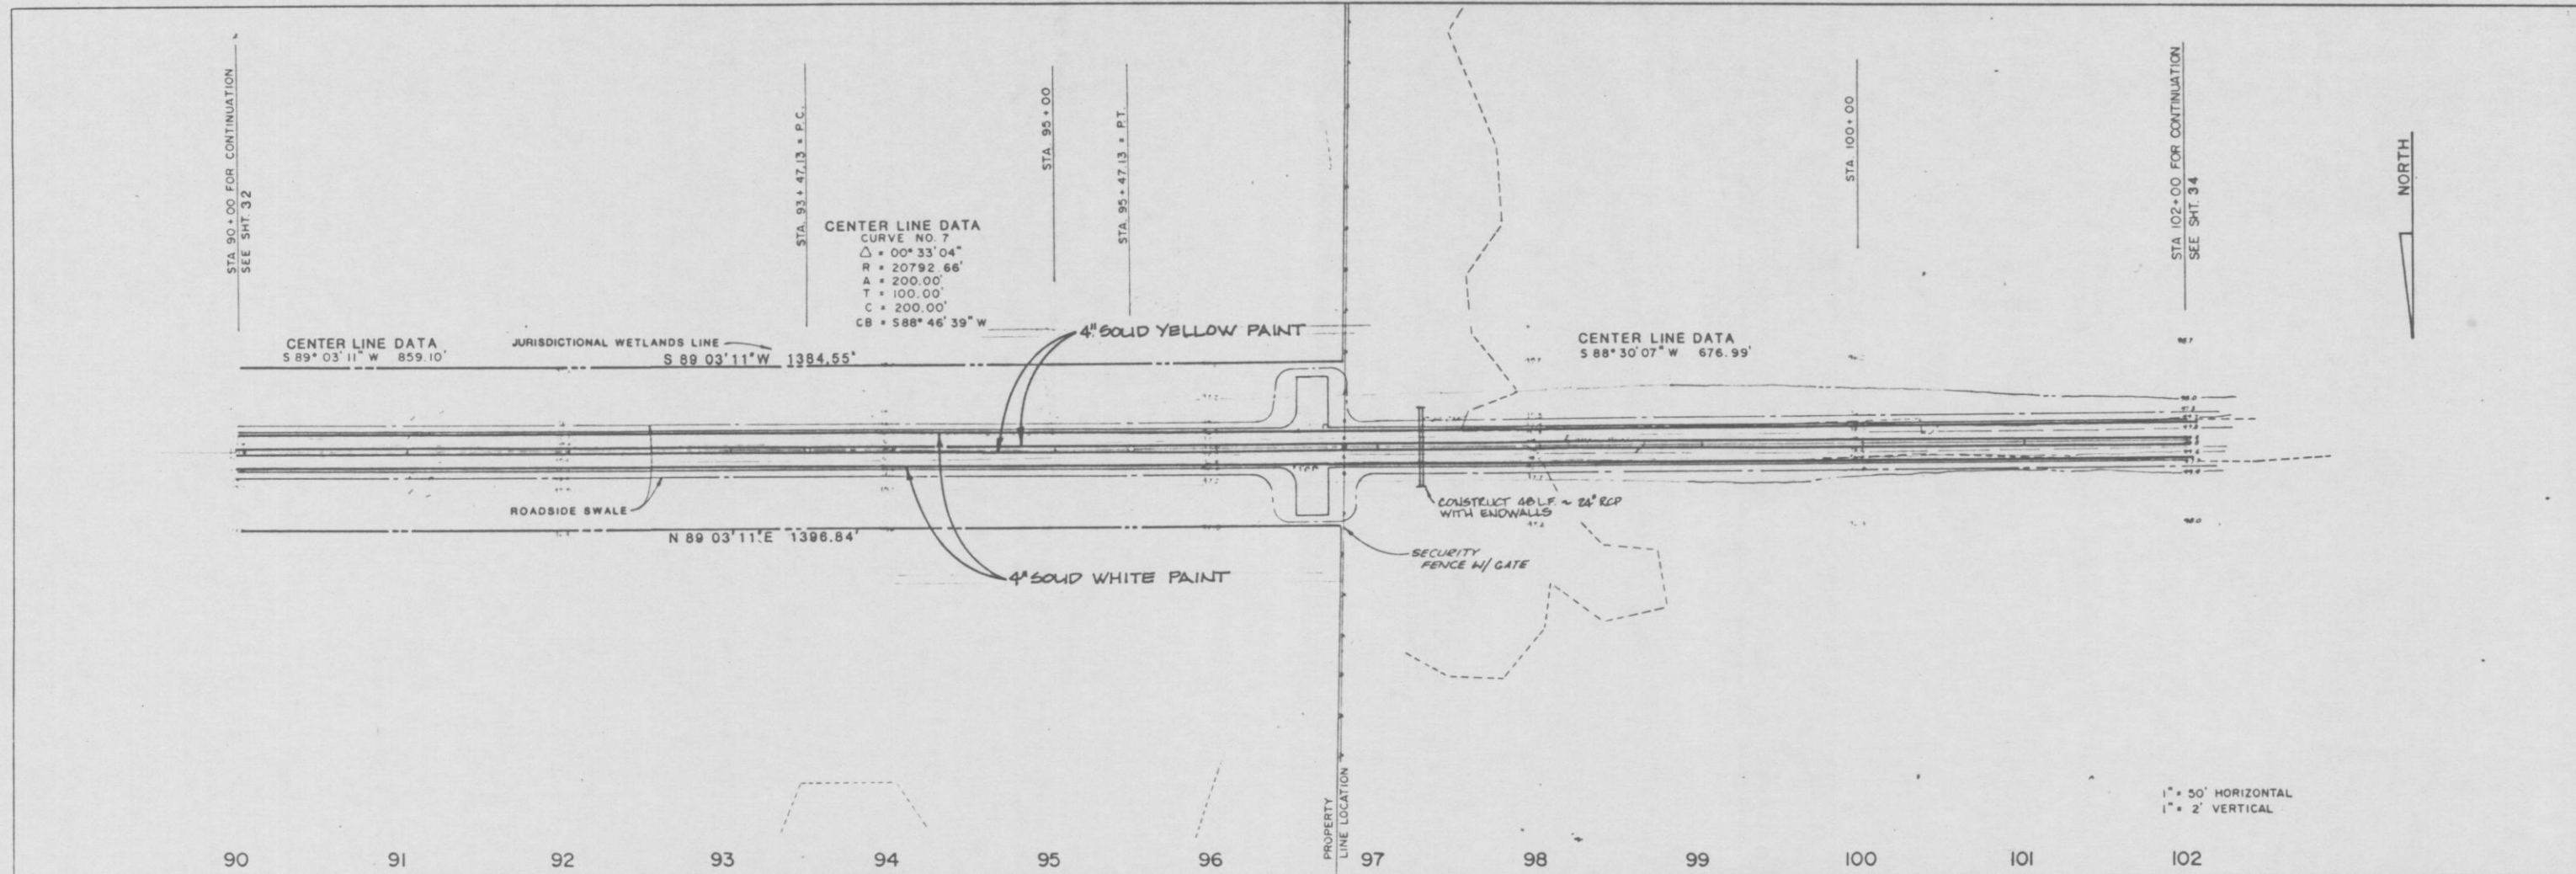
PLAN PROFILE OF P.A.S.E. STANDARD
